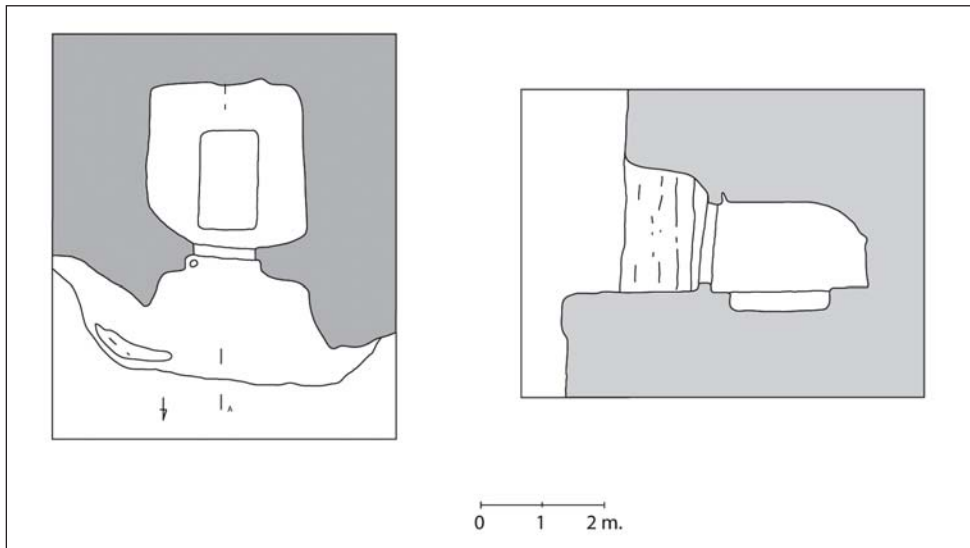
The plan and section of the single roomed rock-cut tomb at Bağın I (Çevik 2000, pl. 49a).
